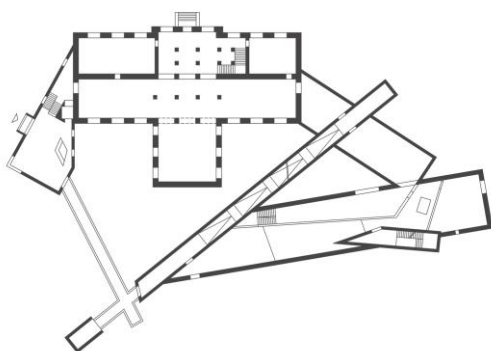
Felix Nussbaum Haus, schematic plan. Source: author
